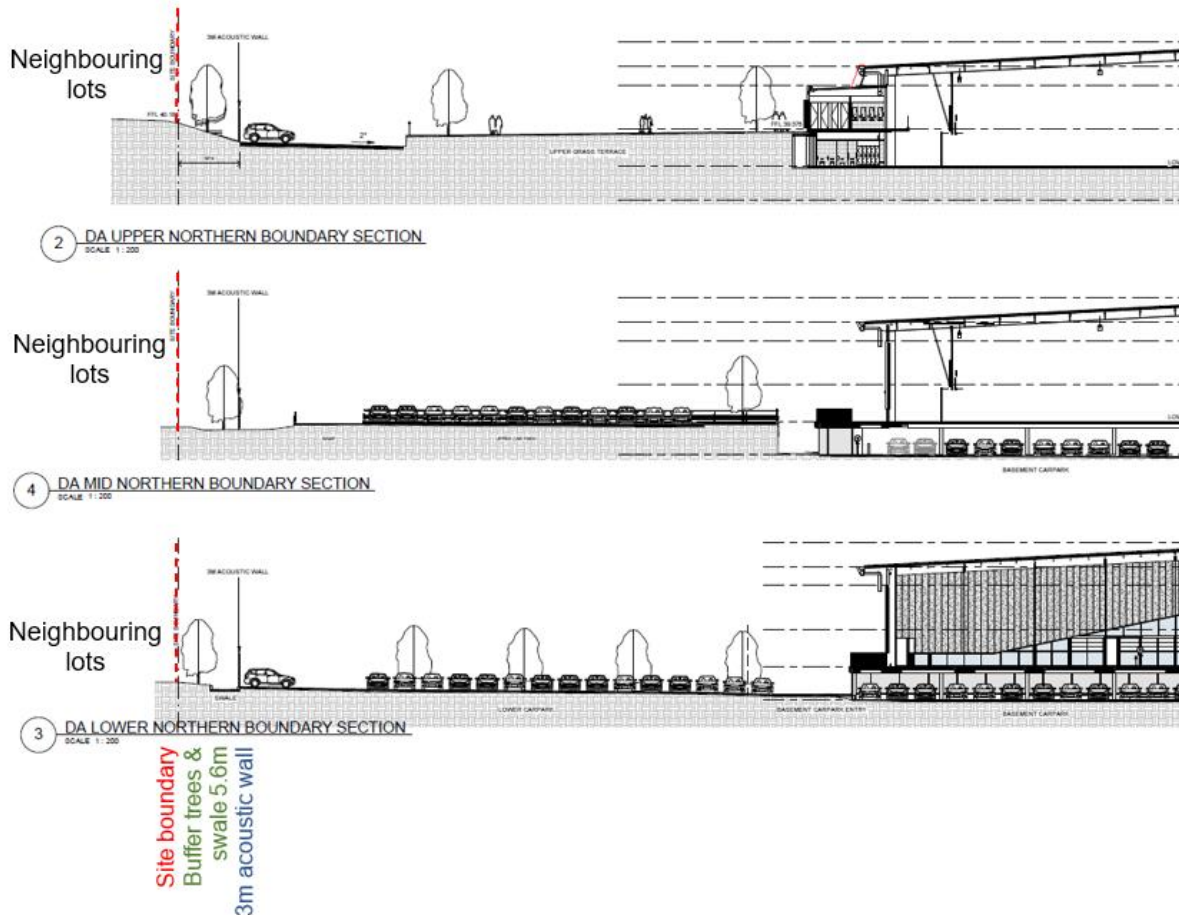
Extract from Site Section Plan DA-40-03 showing the neighbouring residences to the north (multi dwelling units at 46 Winbourne Street & dwellings at 4, 5, 6 & 7 Daphne Street) (left), 5.6m wide buffer trees & swale, acoustic wall, open parking area & building (right).
